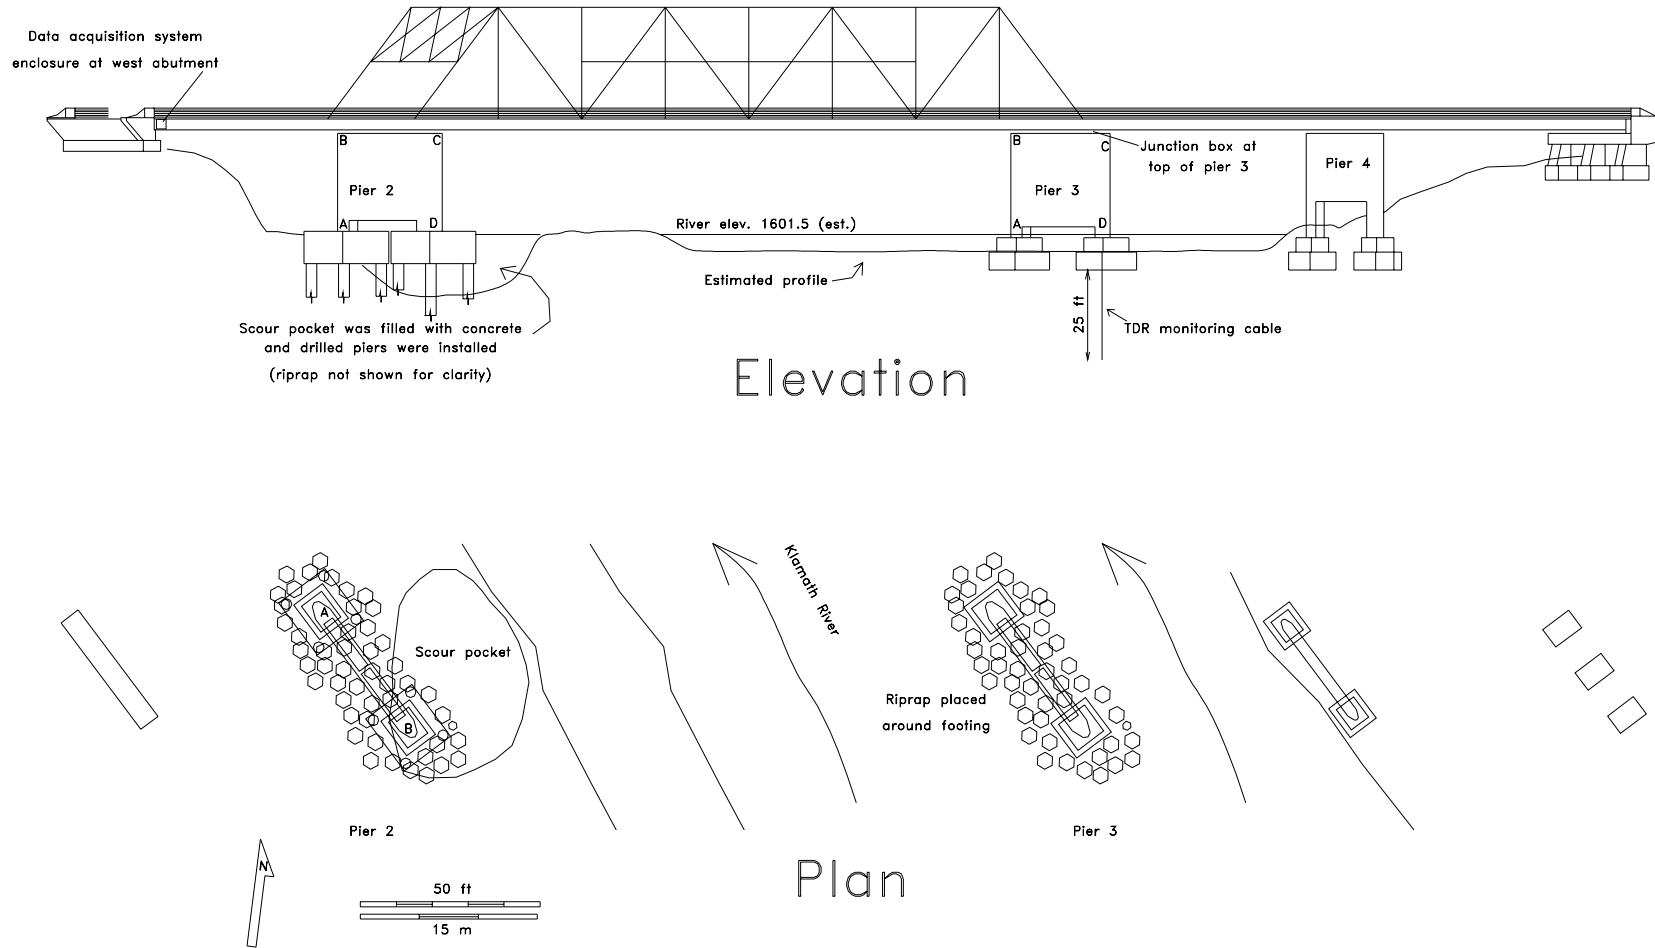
Plan view and elevation of the bridge 02-117 over the Klamath River, Horse Creek, CA
